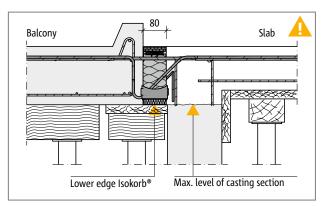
Schöck Isokorb® T type K-E, K-T: Fully-finished balcony with height offset floor on reinforced concrete wall
